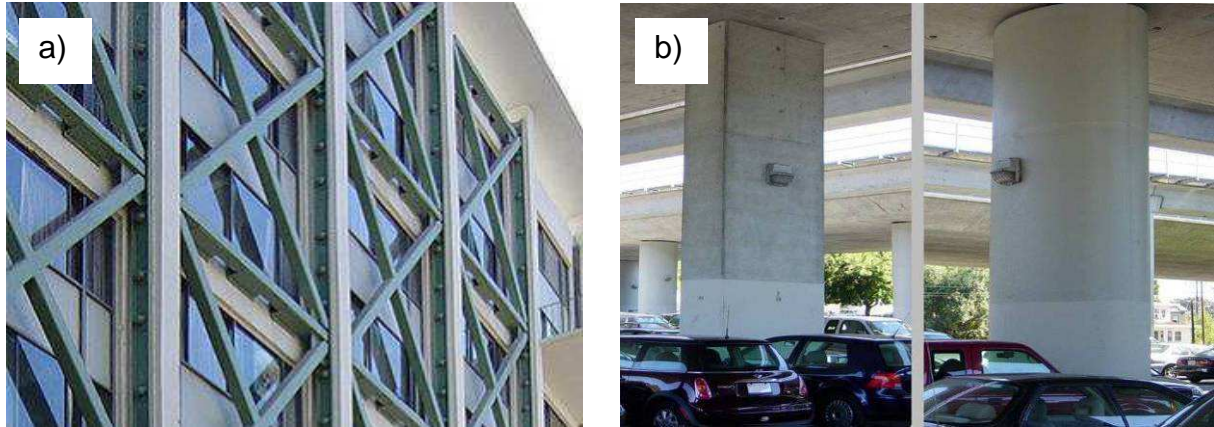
Examples of application of anchors for structural connections: a) Steel bracing fixed to main RC structure (Source: Wikipedia); b) FRP fixed to existing RC column, before (left) and after (right) jacketing (Source: Wikipedia)
